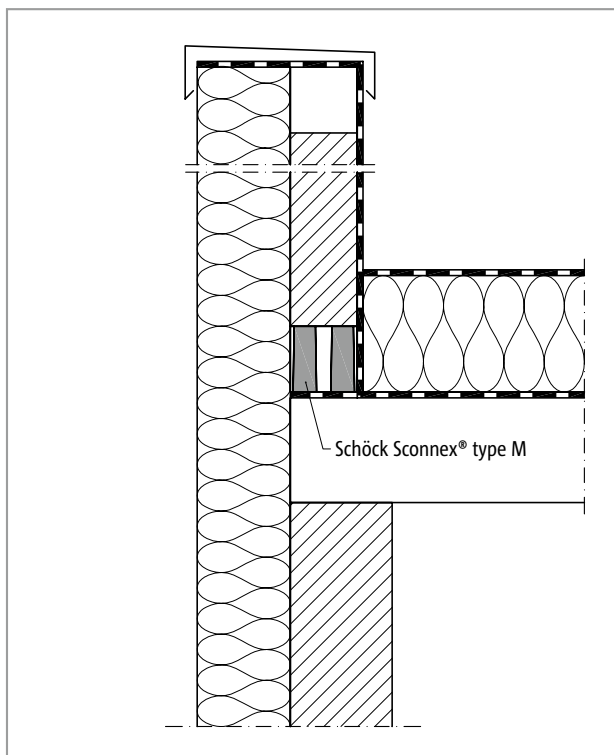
Schöck Sconnex® type M: Installation condition in a parapet
